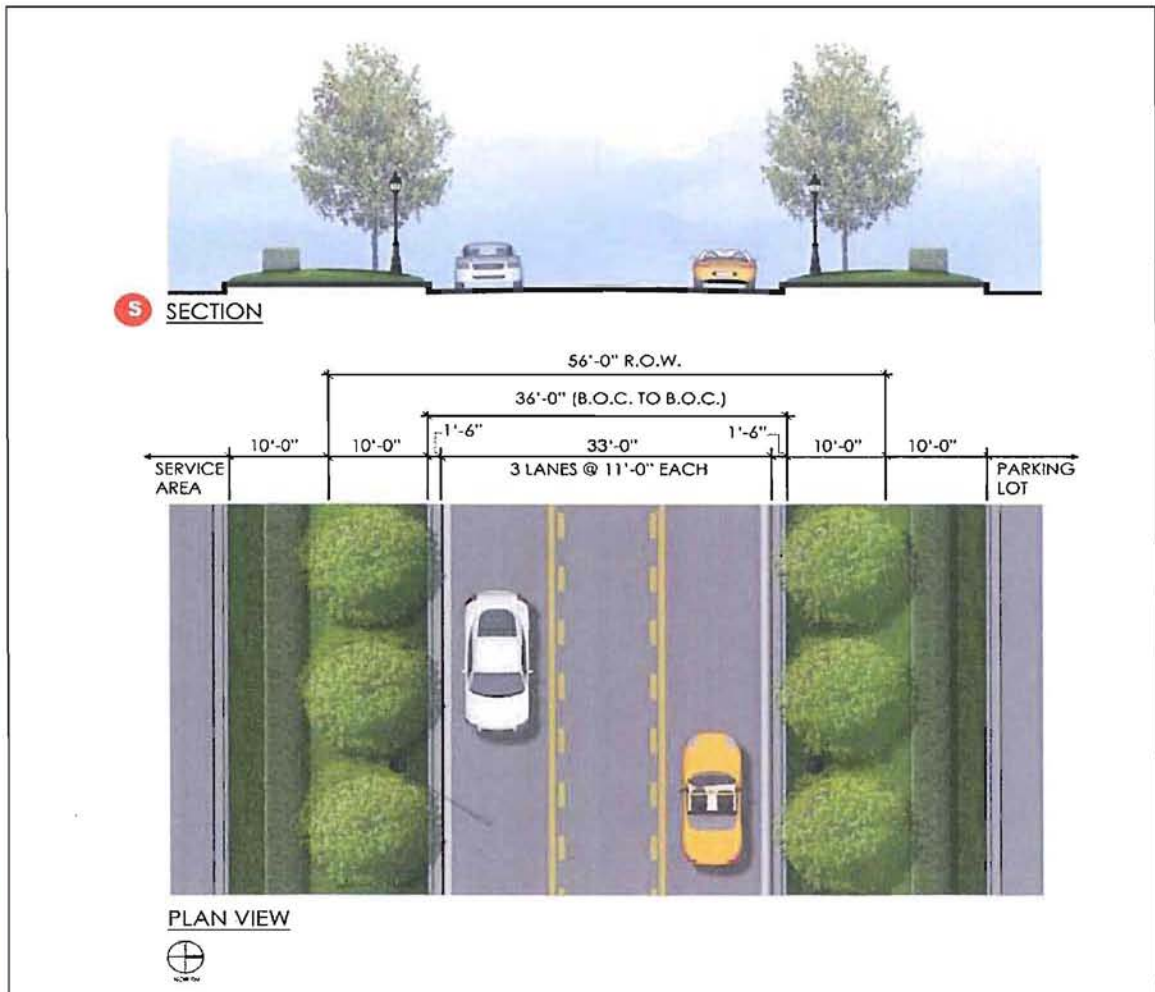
Conference District Circulation Plan New Street Cross Section - Birchler Arroyo Associates, Inc. 2007
